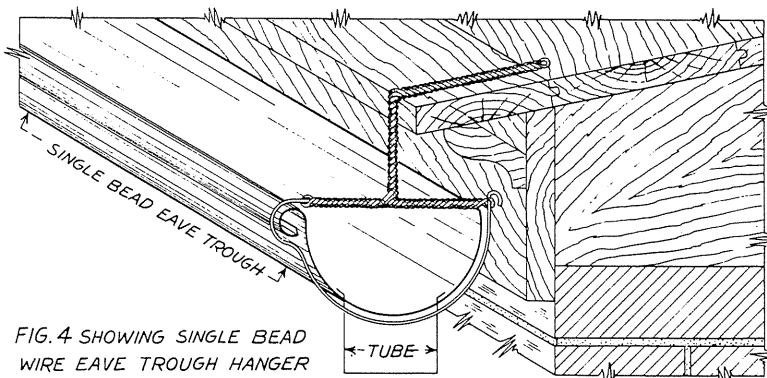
SHOWING SINGLE BEAD WIRE EAVE TROUGH HANGER
